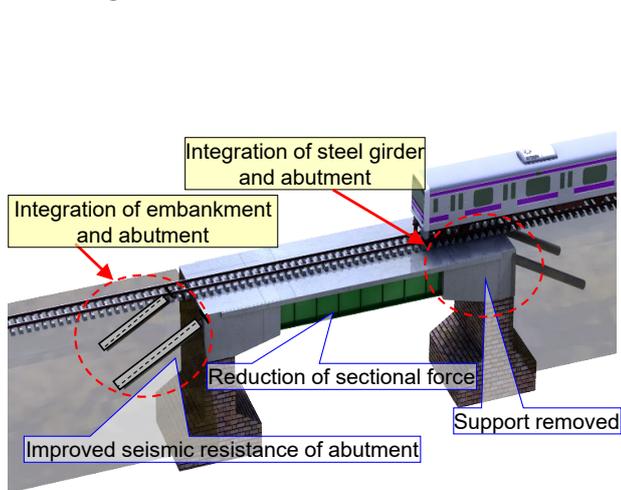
Integrated structural method of steel girder, abutments and backfills (Integral bridge with nail-reinforced soils)
